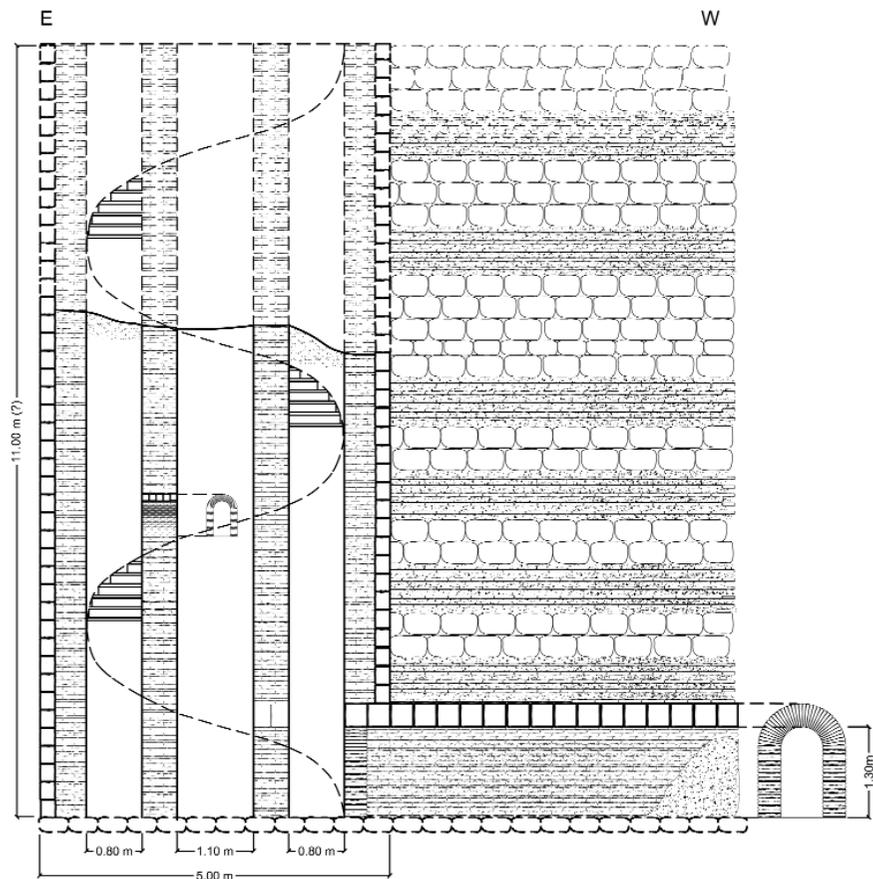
(right) Sectioned elevation of water tower at the Fildamı reservoir. (By Paulo Bono)
